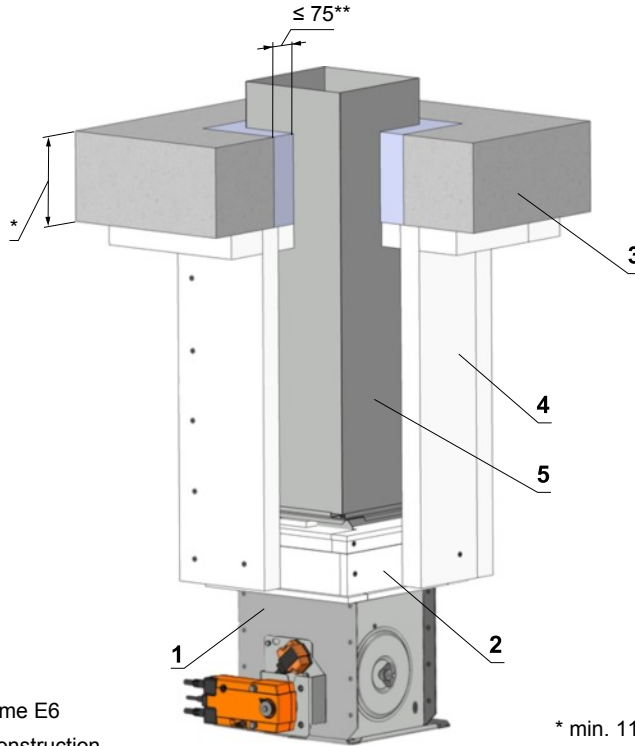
Outside solid ceiling construction - installation frame E6 with cement lime plates
